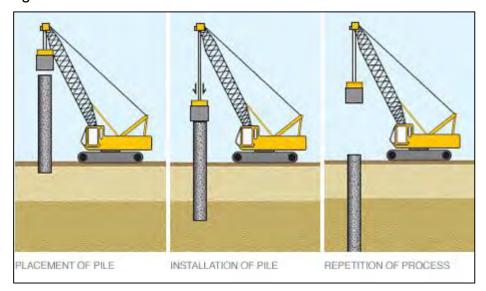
Driven Pile installation process (source: www.dutchfoundation.com)
